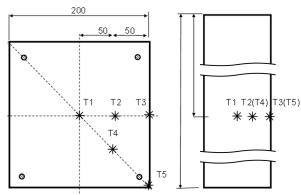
The scheme of location of measuring equipment in the crosssection of a reinforced concrete column - sample for testing
